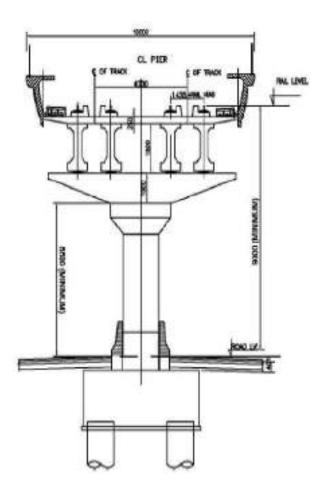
showing the cross-section of Box Girder Viaduct Section The distance between the rail and ground level is 9 meters. During train operation, the
